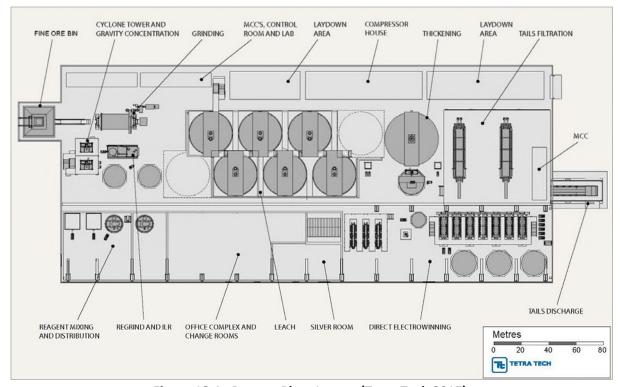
Process Plant Layout (Tetra Tech 2017)
